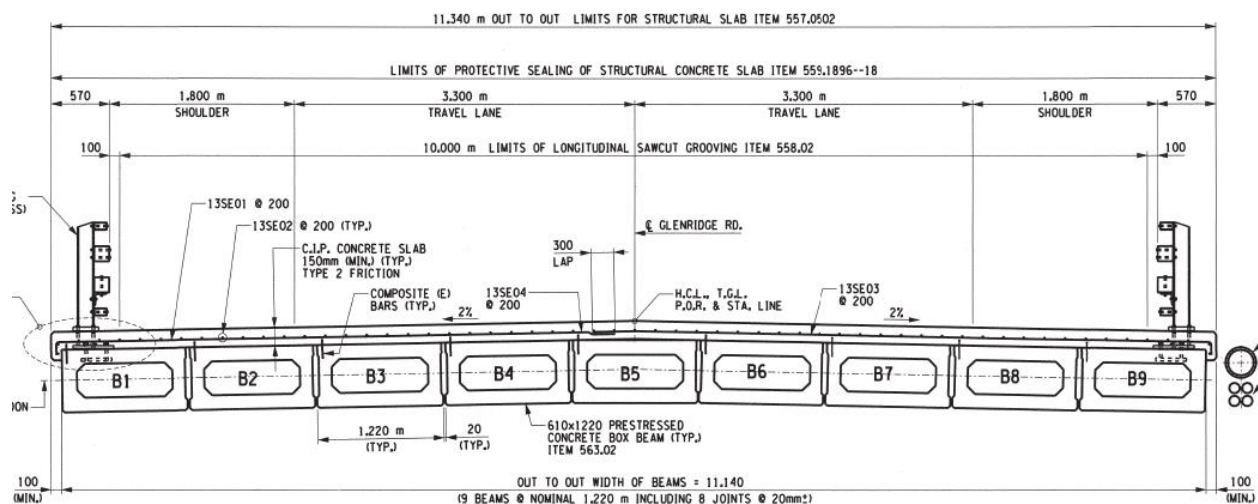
Section View of Glenridge Road over Alplaus Kill
